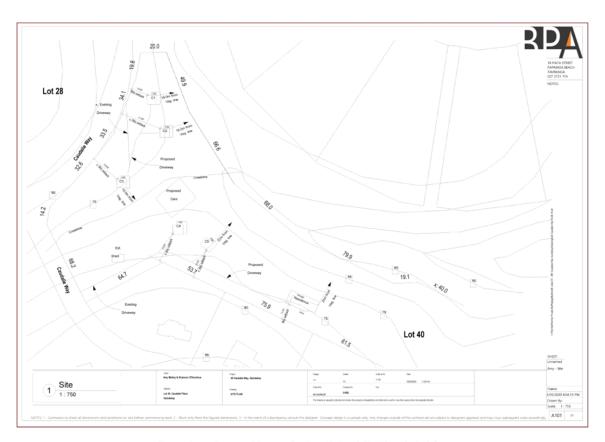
Proposed Layout for Lot 40 Caudalie Way, Quindalup
